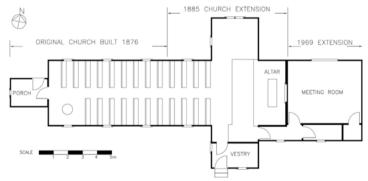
Plan of St Fillan's Episcopal Church, showing extension over time.
